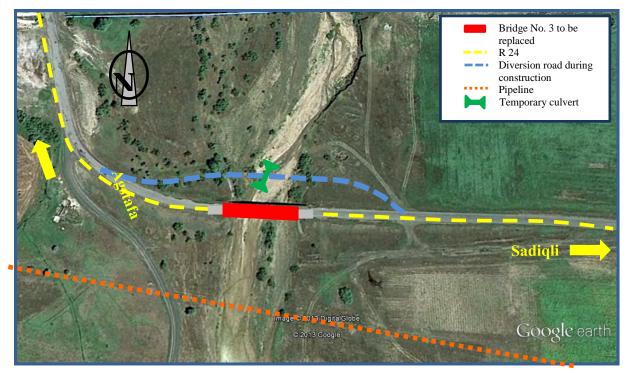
Bridge No. 3 Location Map with Reconstruction Alignment
